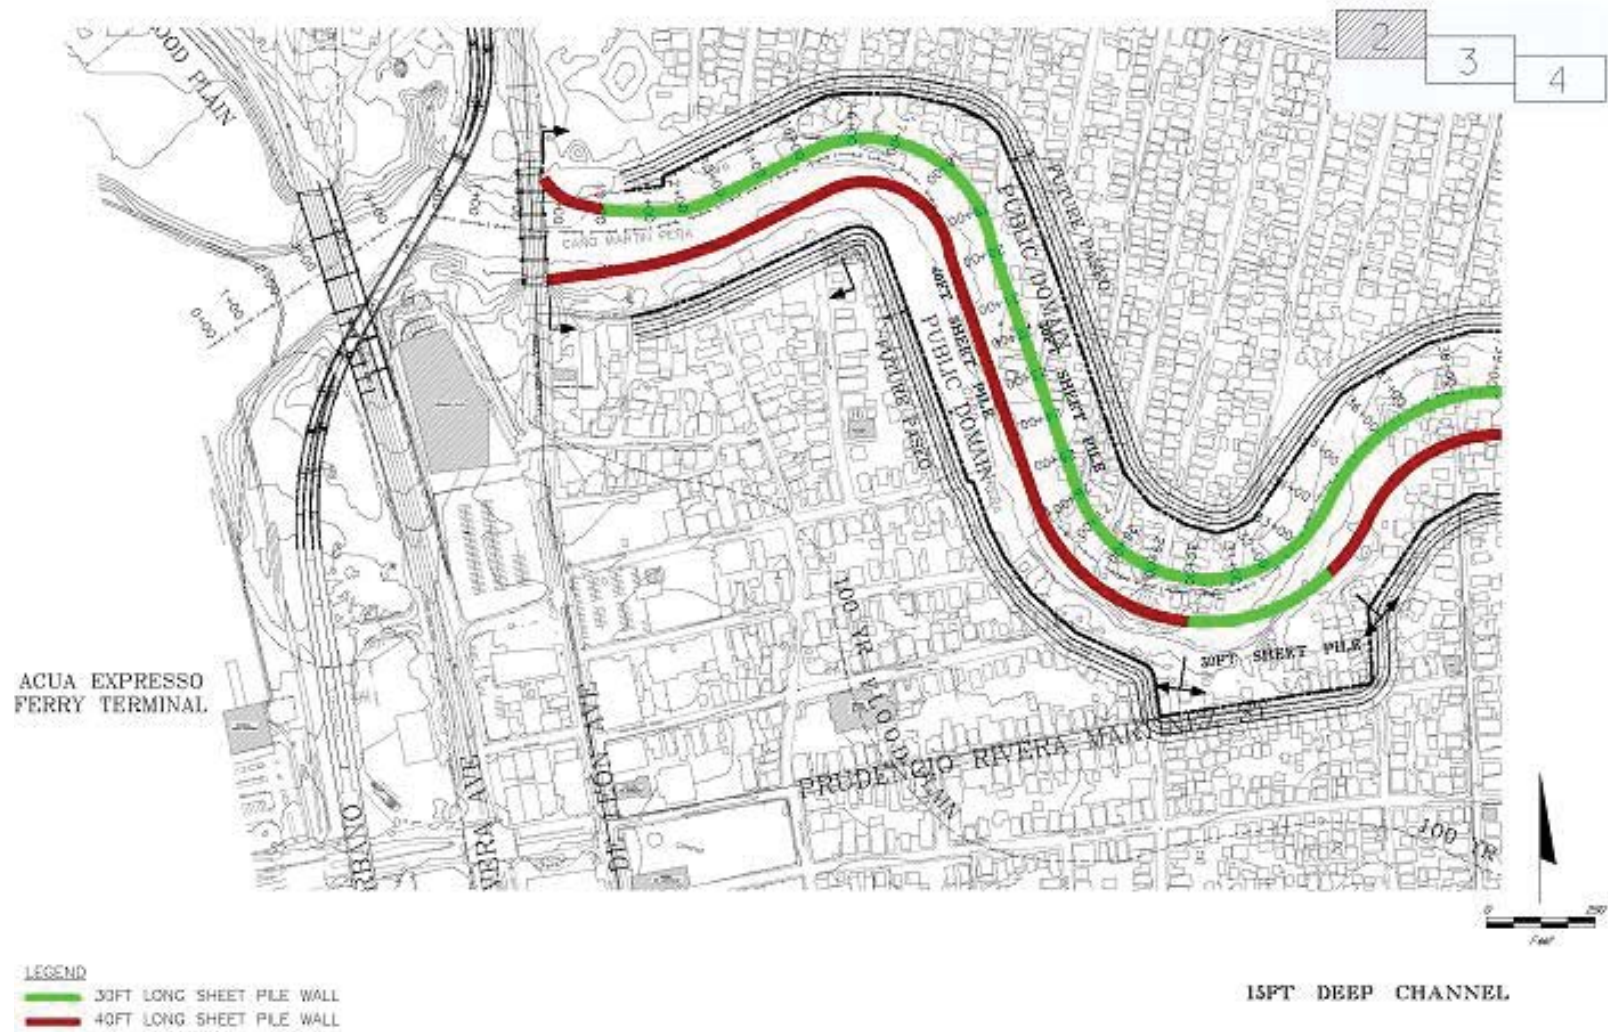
Sheet Pile Wall Layout, 15-foot-deep Channel
